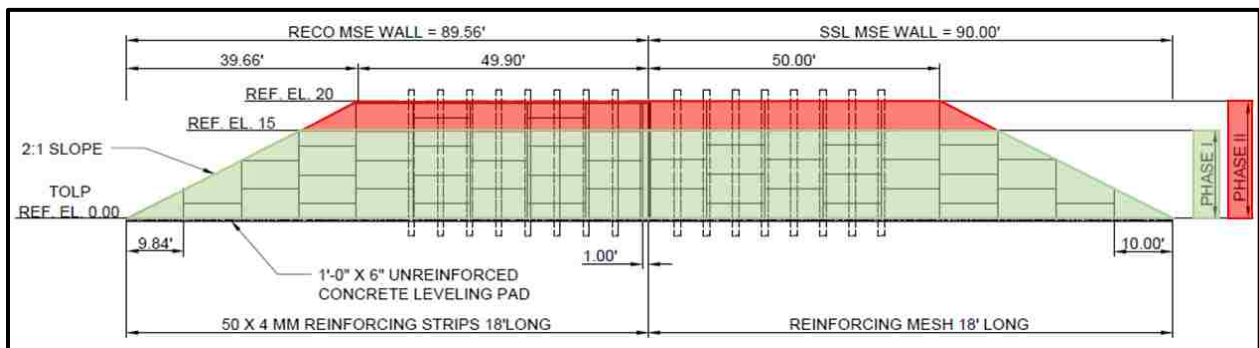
Elevation view of the MSE wall highlighting different phases of construction.
